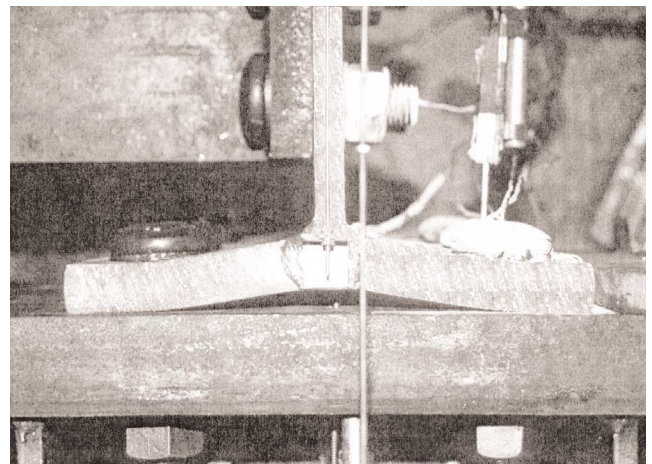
T-stub flange prying prior to tension bolt fracture.
